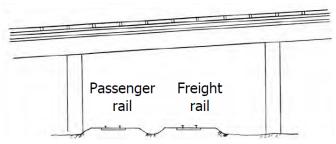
Bridge elevation view with one passenger rail and one freight rail track below the bridge.
